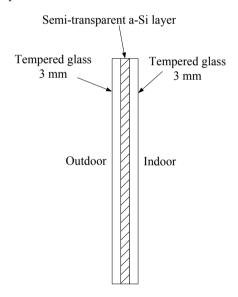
Cross section of a typical a-Si semi-transparent PV window
